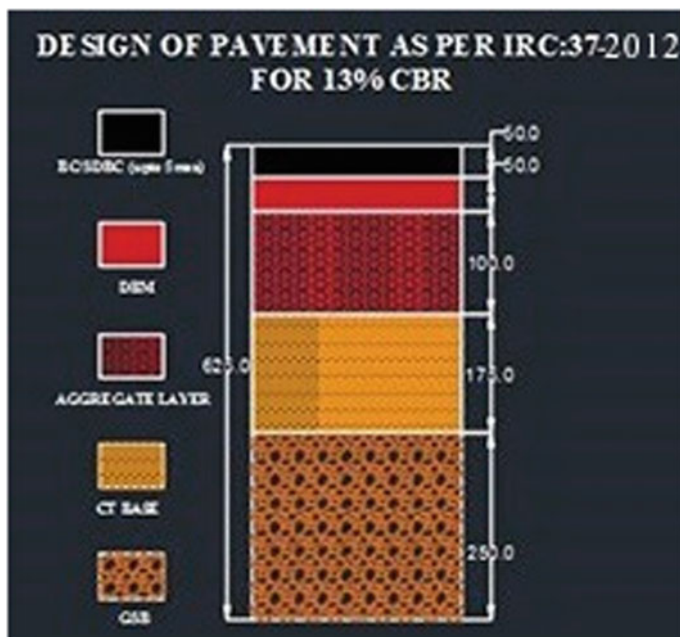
Design of pavement Cross-section 5 as per IRC:37-2012 for 13% CBR in mm
